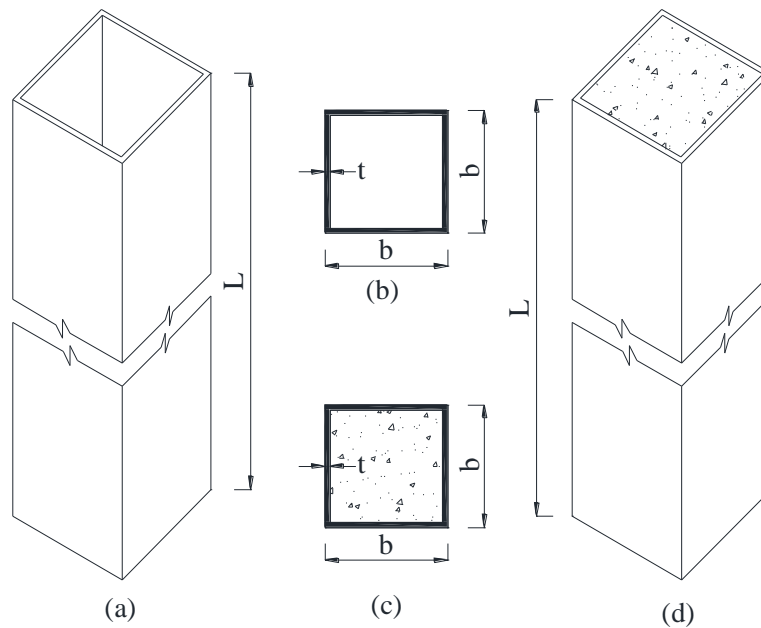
Geometry of CFST test specimens, (a) Hollow Steel Tube (HST), (b) Cross-section of HST, (c) Cross-section of CFST, and (d) Concrete Filled Steel Tube (CFST)
